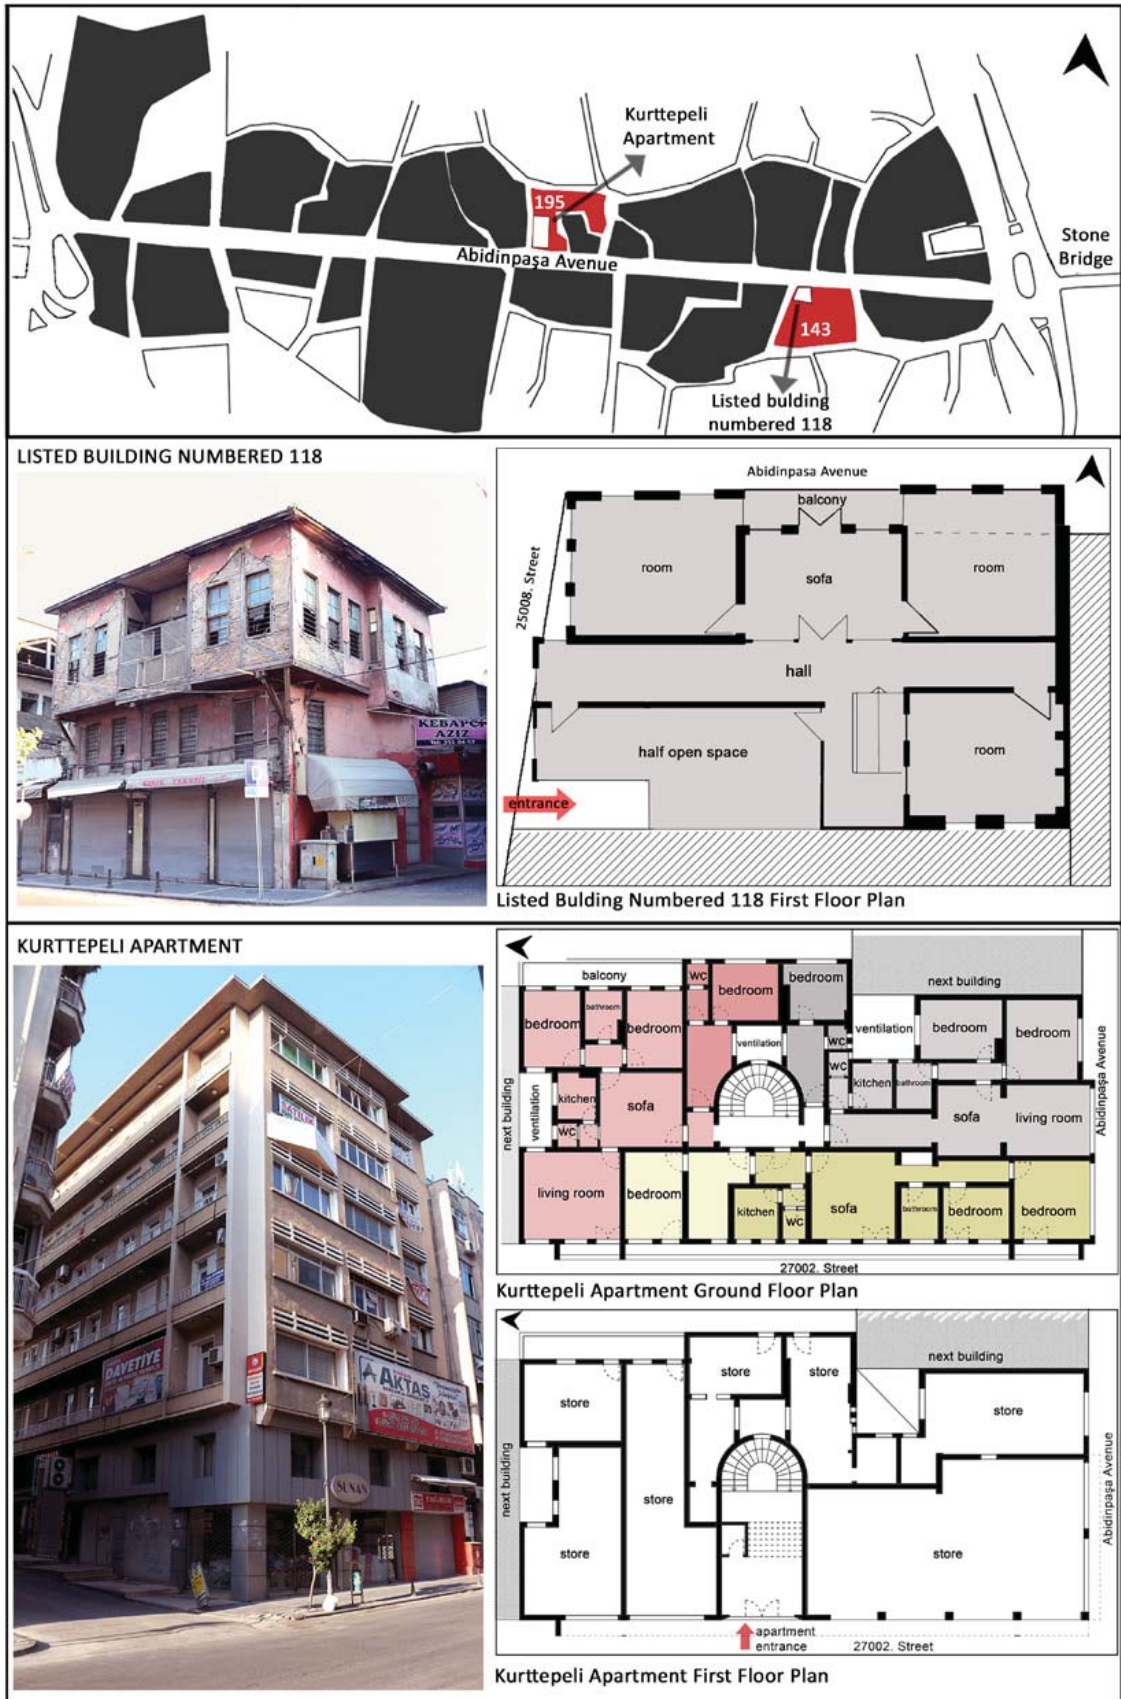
Locations, floor plans and photographs of Kurttepelı Apartment and the listed building numbered 118 (edited from Şahin, 2018: 163-165 & Saban, Erman, 2011: 78-81).
